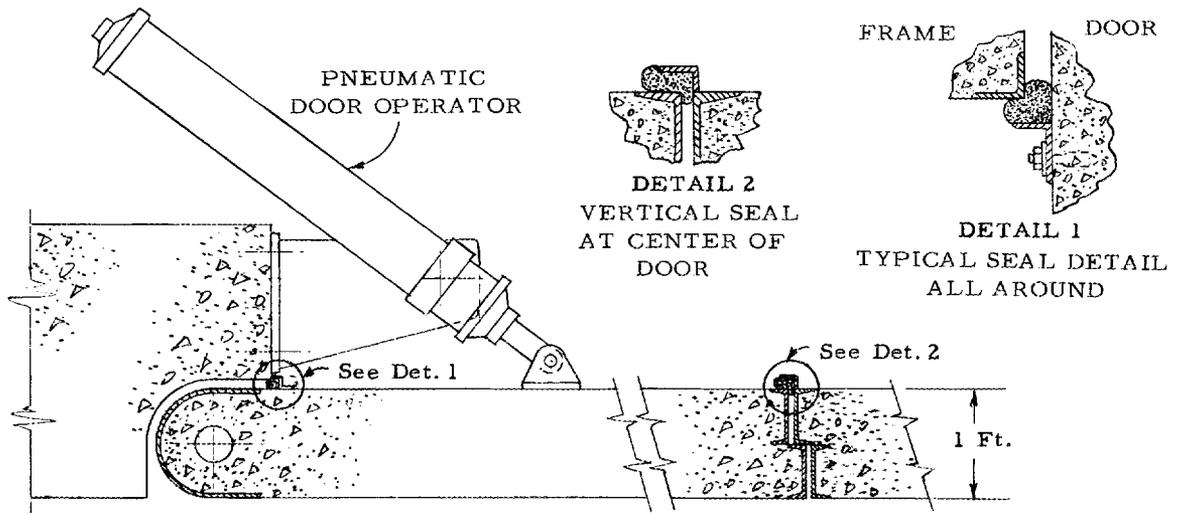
Double-Leaf Railroad Door at Humboldt Bay Refueling Building.
